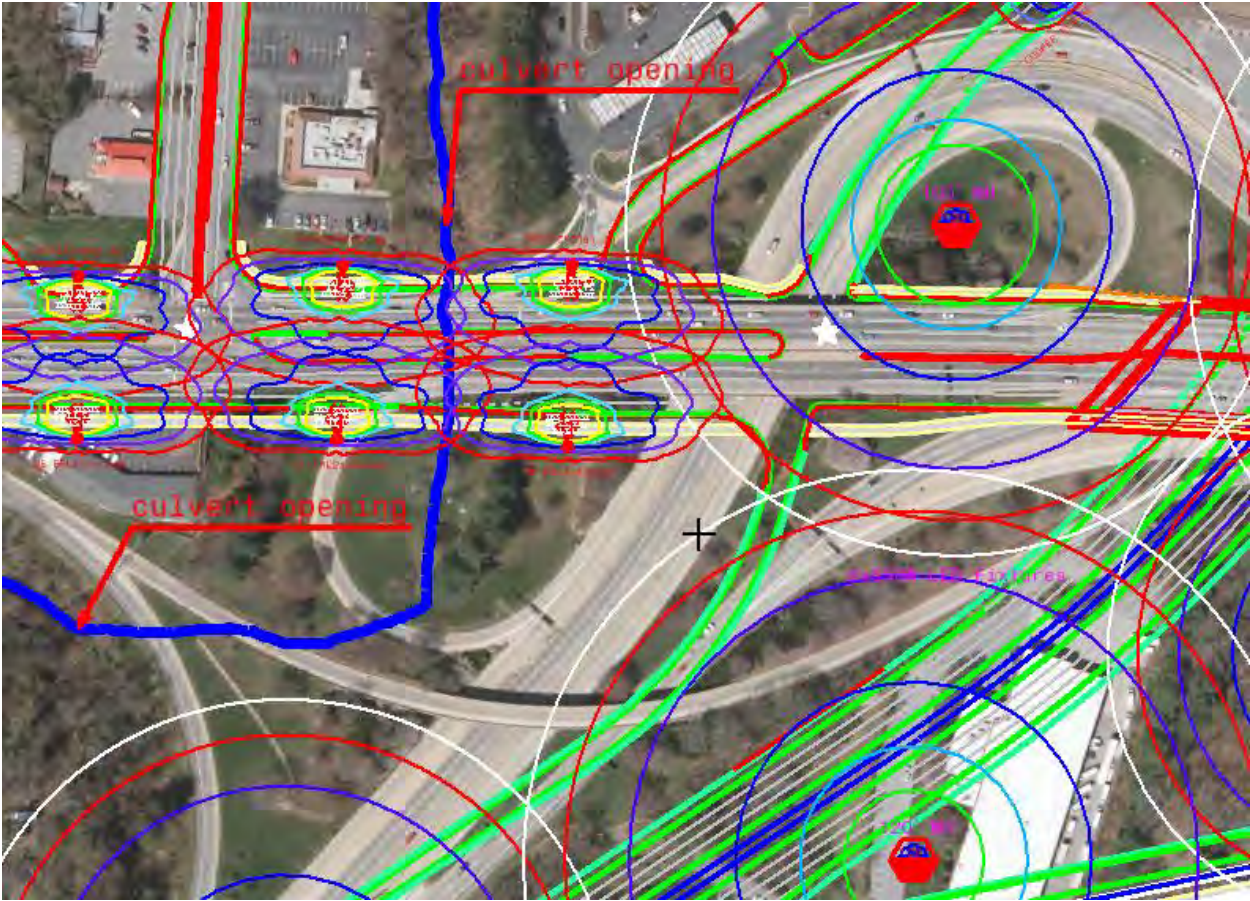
Proposed lighting layout at Smith Mill Creek culvert after interchange reconfiguration.
